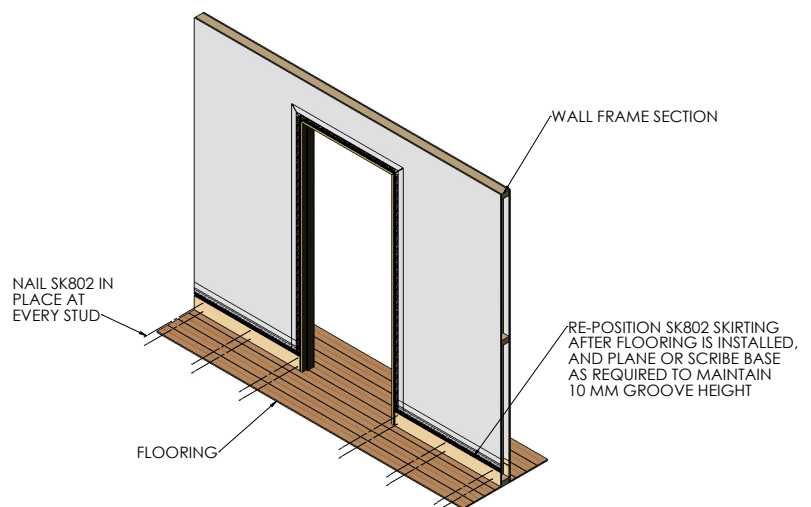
LOWER SKIRTING SECTION FIXING DETAILS
